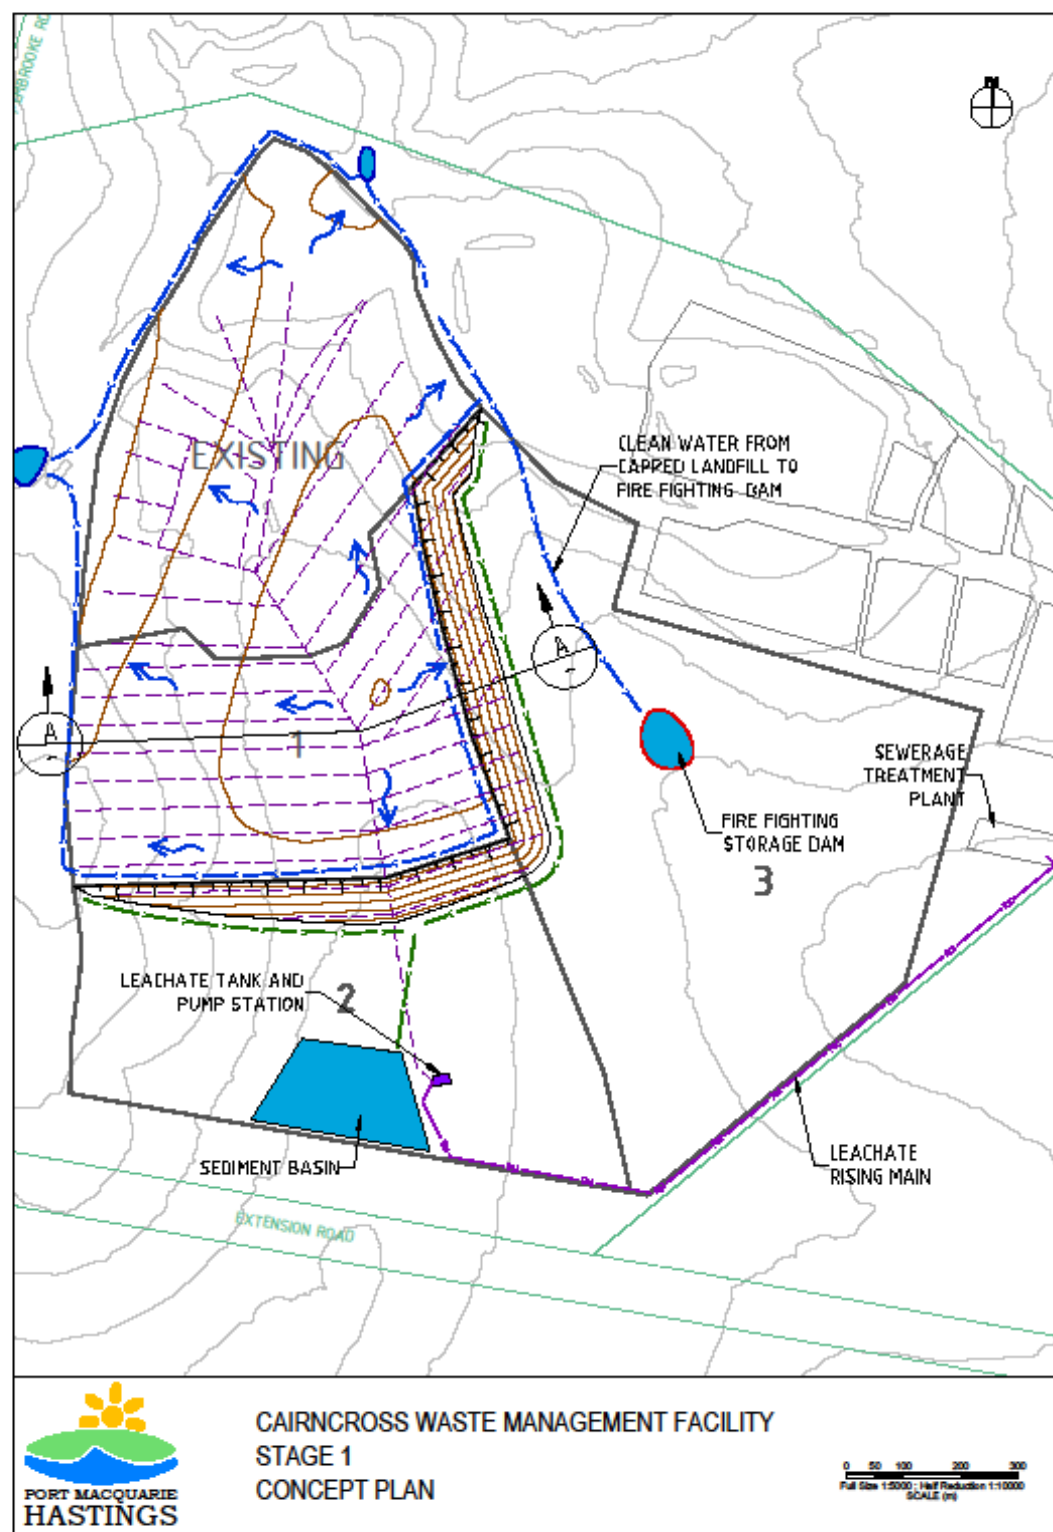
Proposed landfill layout and stages (Stage 1)
